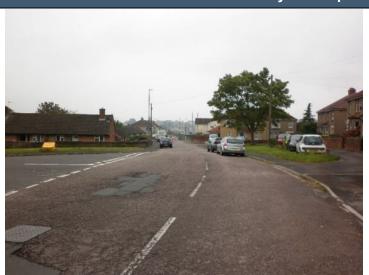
Lees Hill (Facing south by Highview Road Junction)
